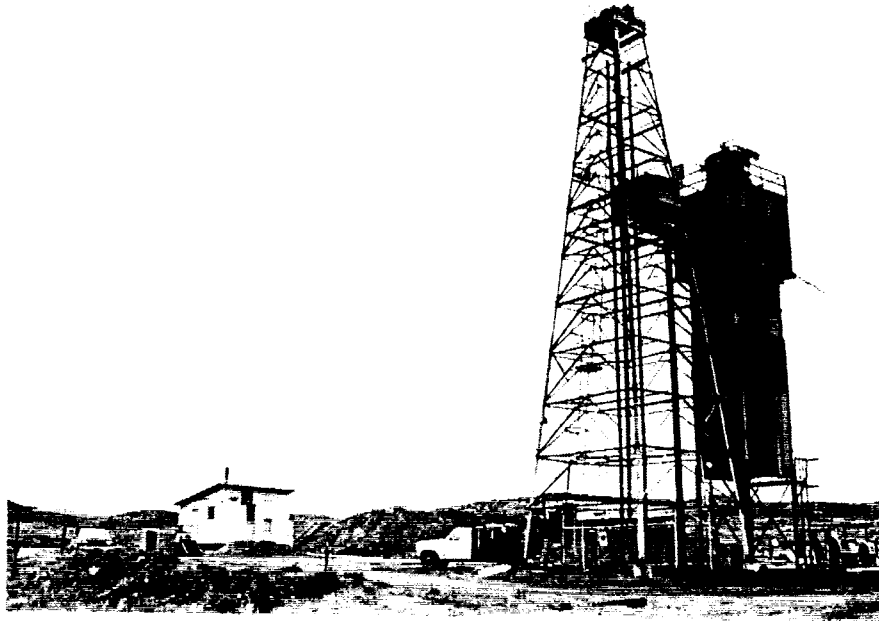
Example of Hoist House and Headframe to be Located at Shafts WH-3 and WH-7.
